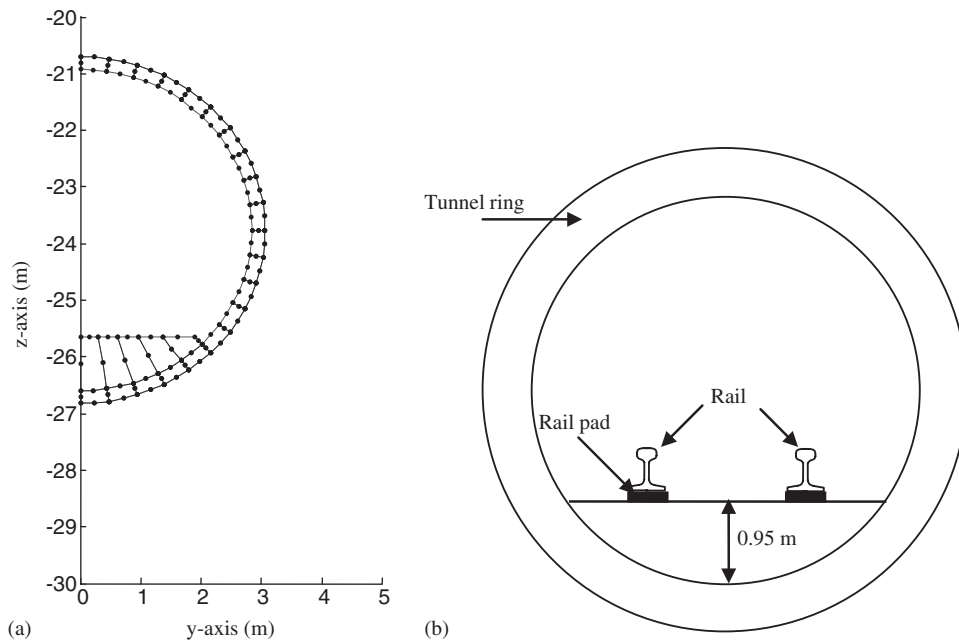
Track/tunnel mesh (a) and cross-section diagram (b) for the tunnel.
